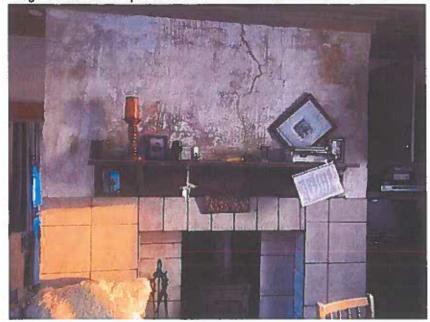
Internal Dampness, Water-staining and Cracks on Chimney Breast
